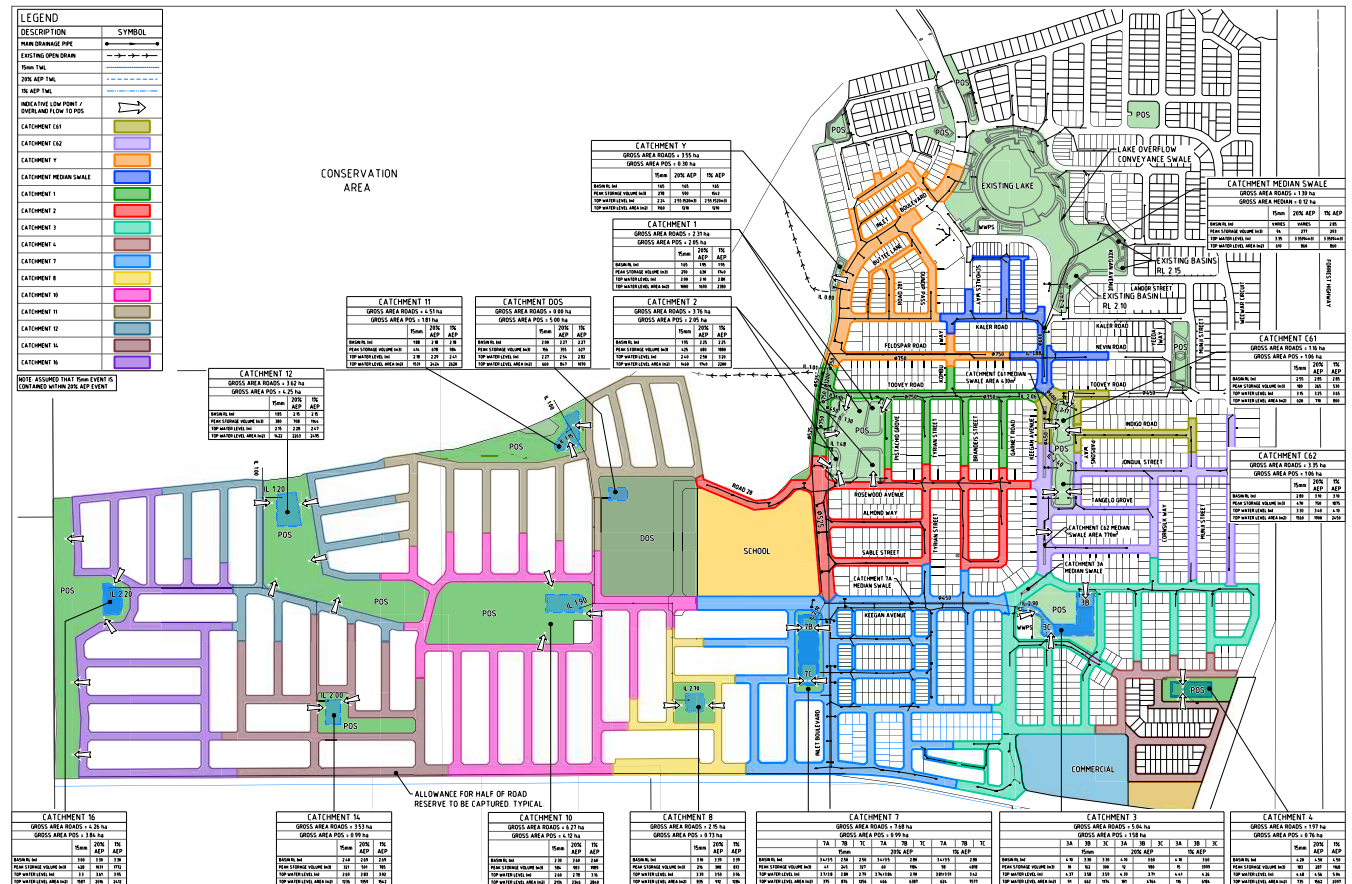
Drainage Strategy Concept Plan (Source: Cossill & Webley)
